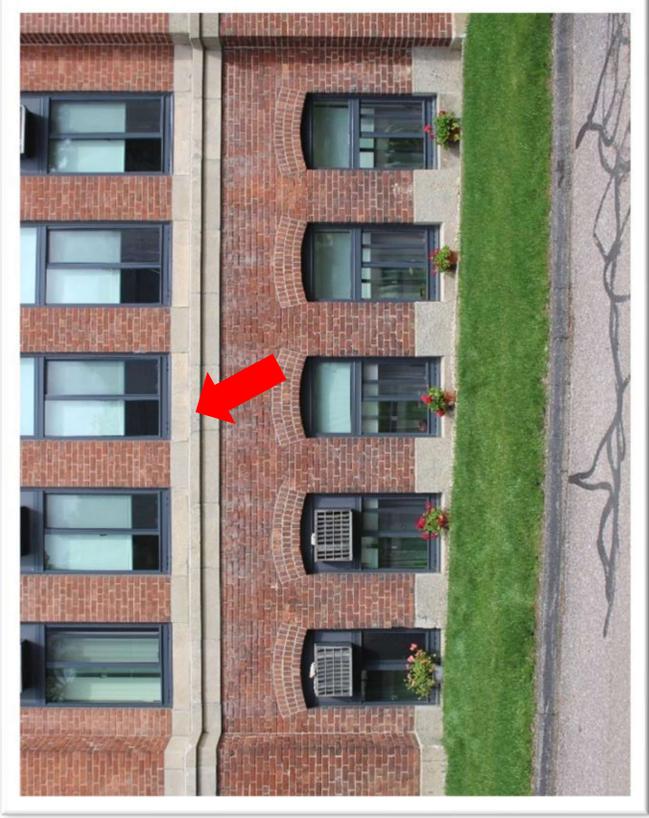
Photo shows precast concrete band along lower portions of historic building.
